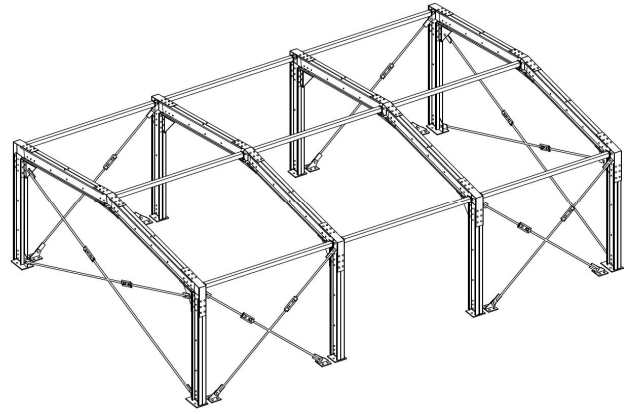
Plain structure: Structure without roof bracings, purlins and sandwich panel cladding.
